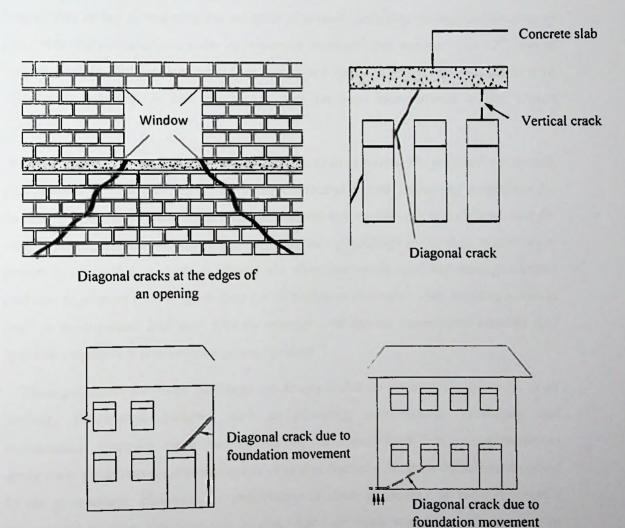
Diagonal cracks at Masonry walls
